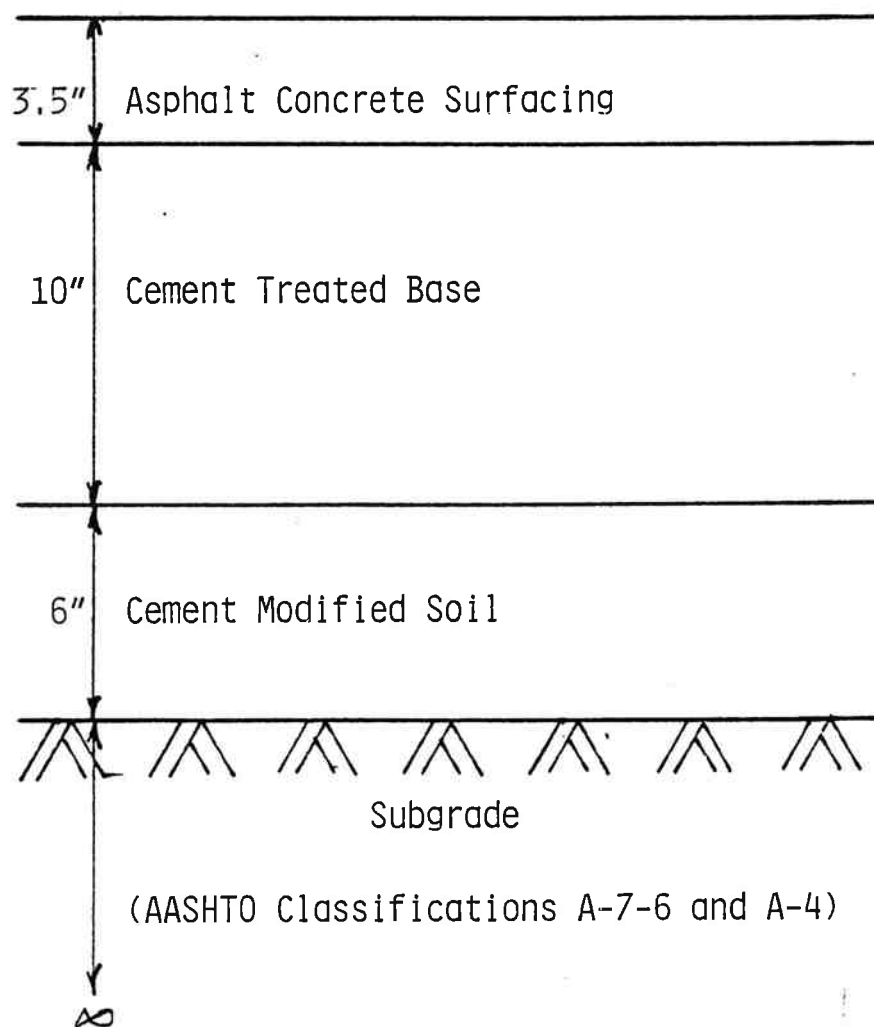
Pavement Cross-Section, Salem Parkway Project
